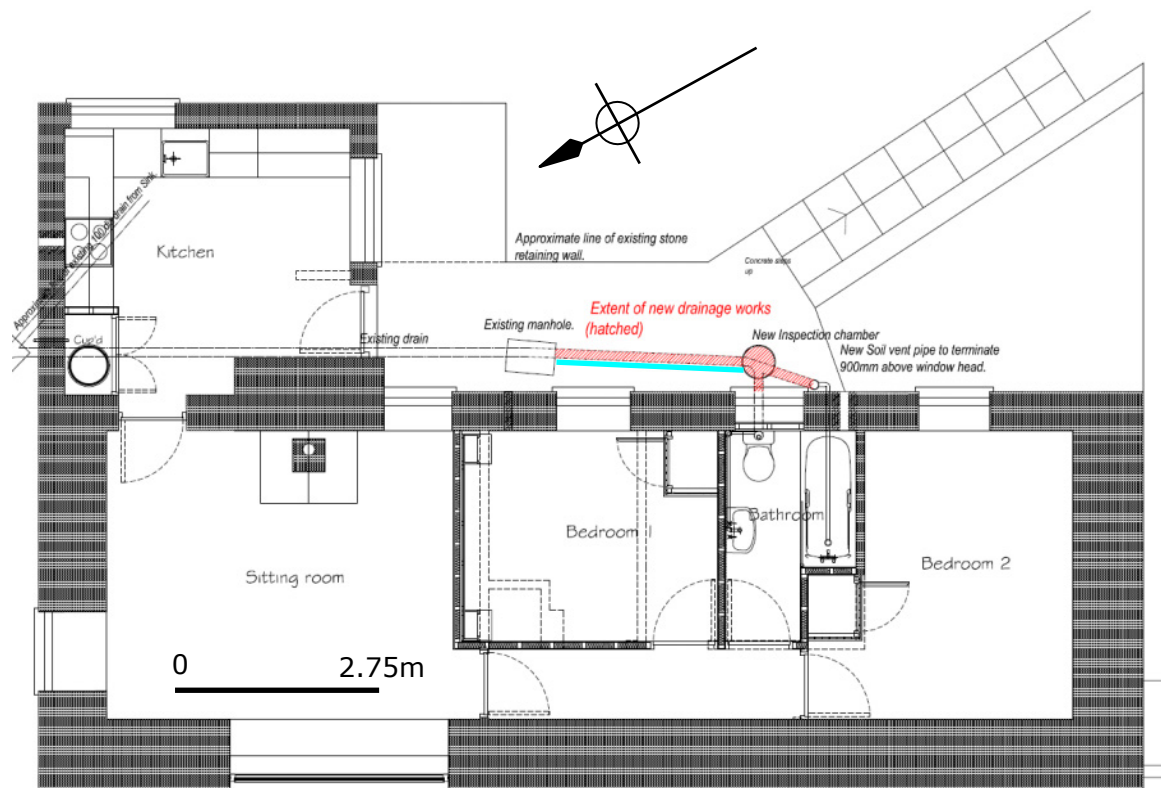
Plan showing the extent of the new drain, the pale blue line marks the line of the section drawing of the drain trench edge (Fig 4)
